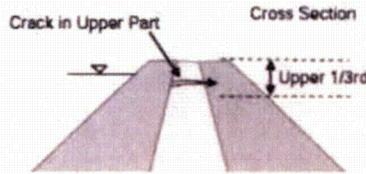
Location of the transverse crack in the upper third of the dam section.
